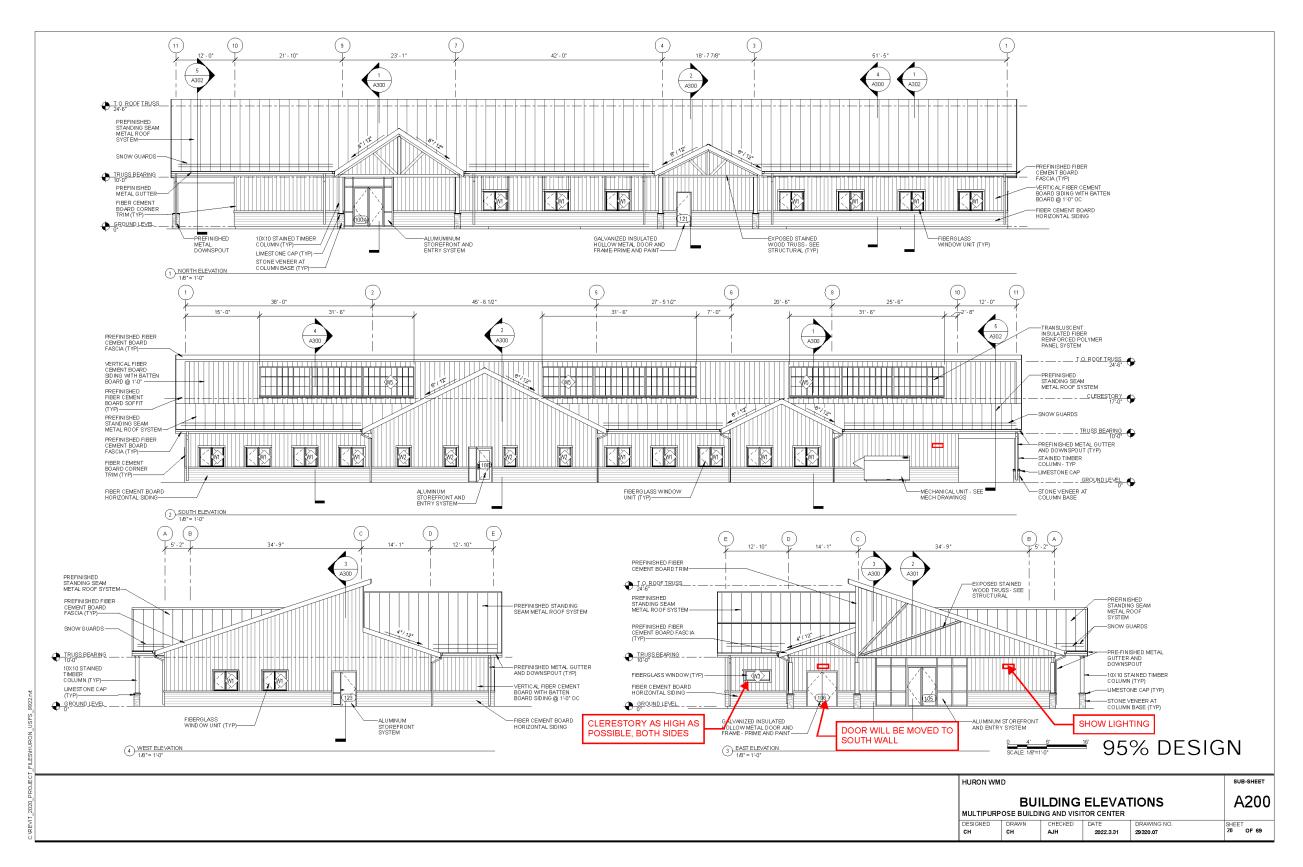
Huron WMD Multipurpose Building and Visitor Center 95% Design Building Elevations Showing Building Aesthetic
